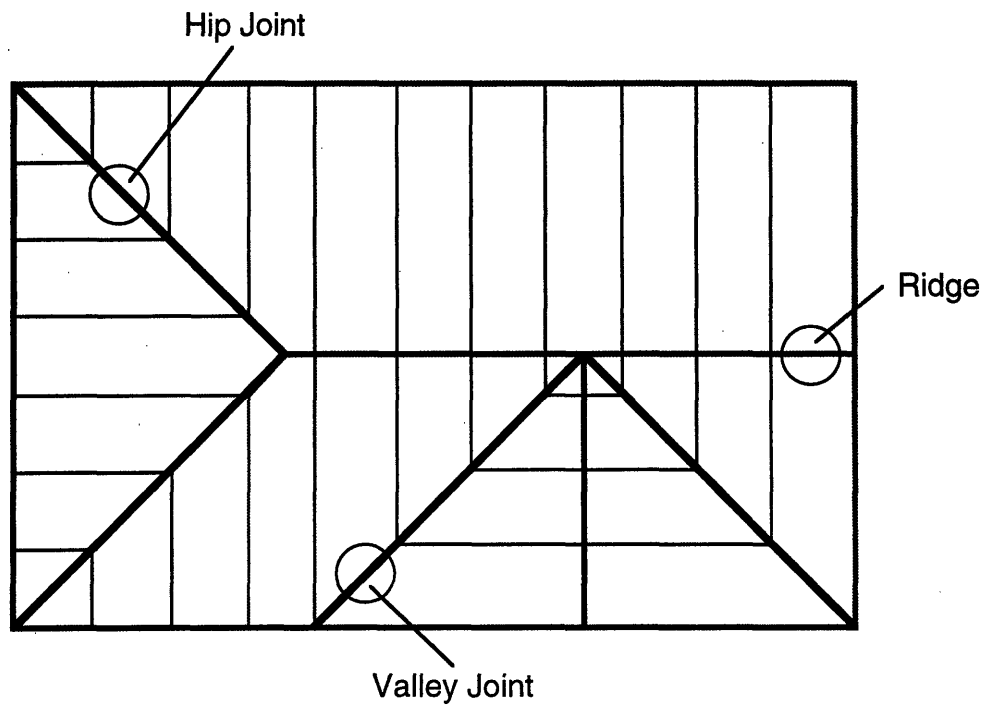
Top view of a typical roof, showing the layout of the panels.
